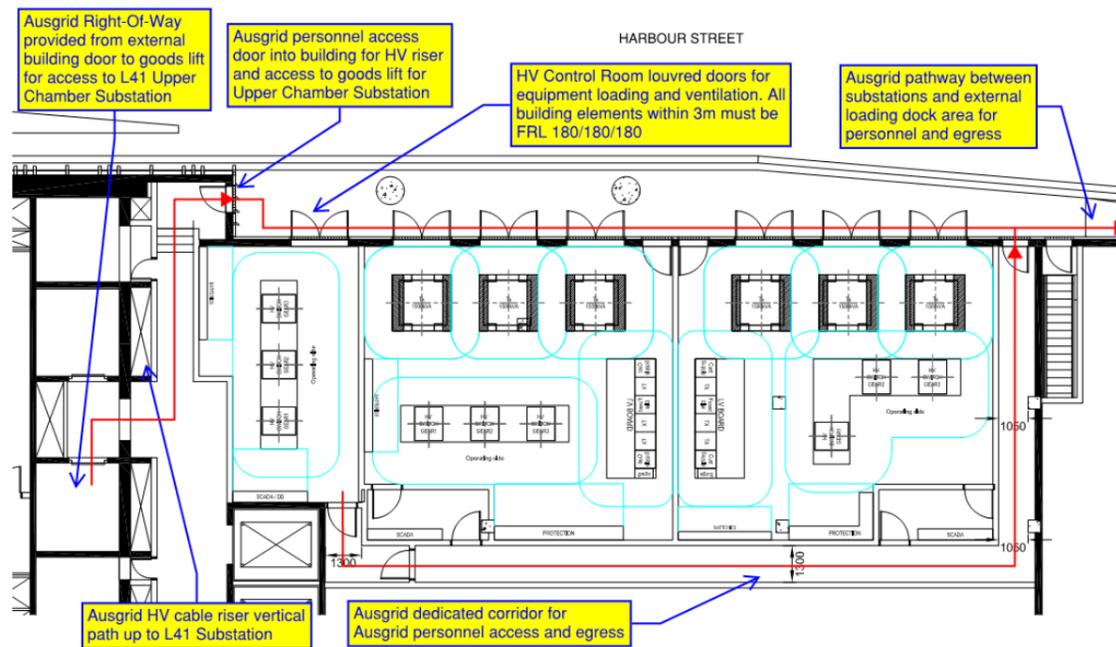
Substation 3 HV Control Room Location & Spatial Layout, Level 00
